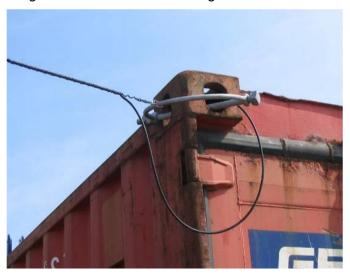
Container Type, showing fixing using half of a Ring Pole Head Dropwire
